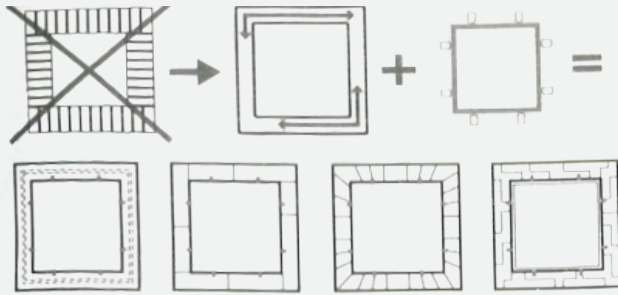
The principle of the flexible layout of 'Het Sluishuis' (Van Zwol, 2005: 35).
